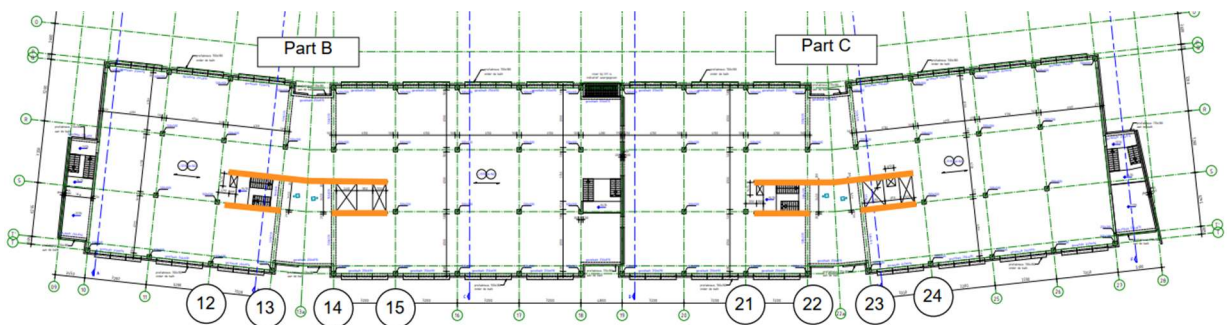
Shear walls in longitudinal direction (Pieters Bouwtechniek B.V., 2018a)
